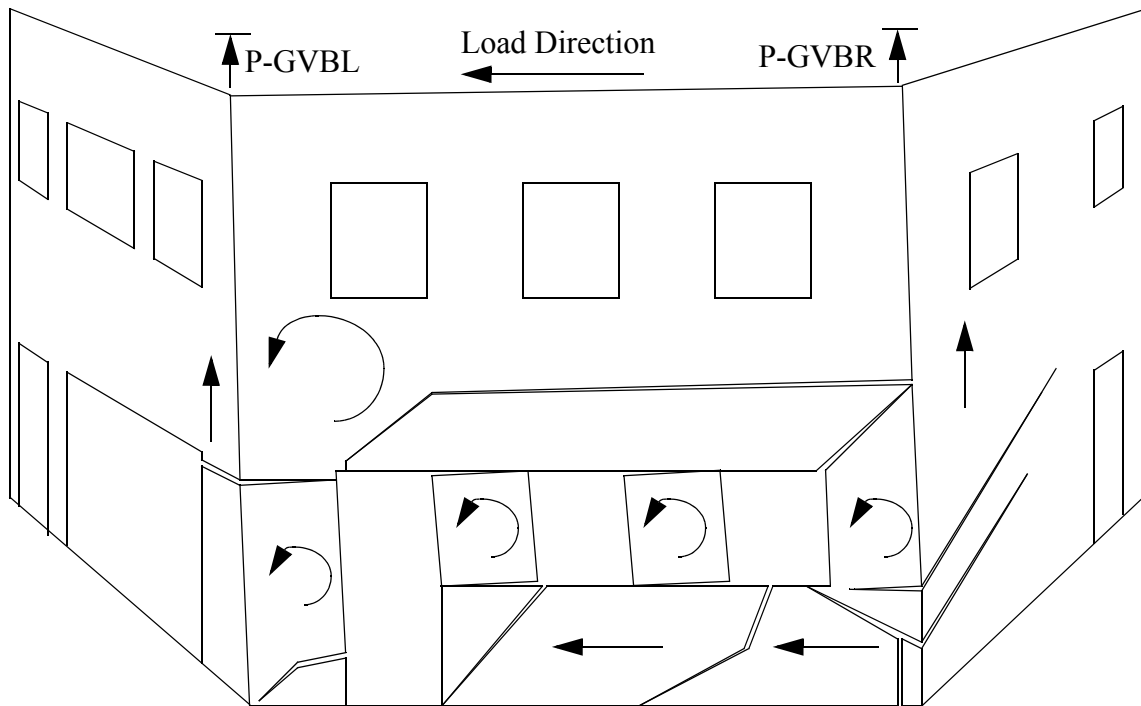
Exaggerated schematic illustrating the final mechanism of Wall 1 and out-of-plane Walls A and B in the positive direction following retrofit.
